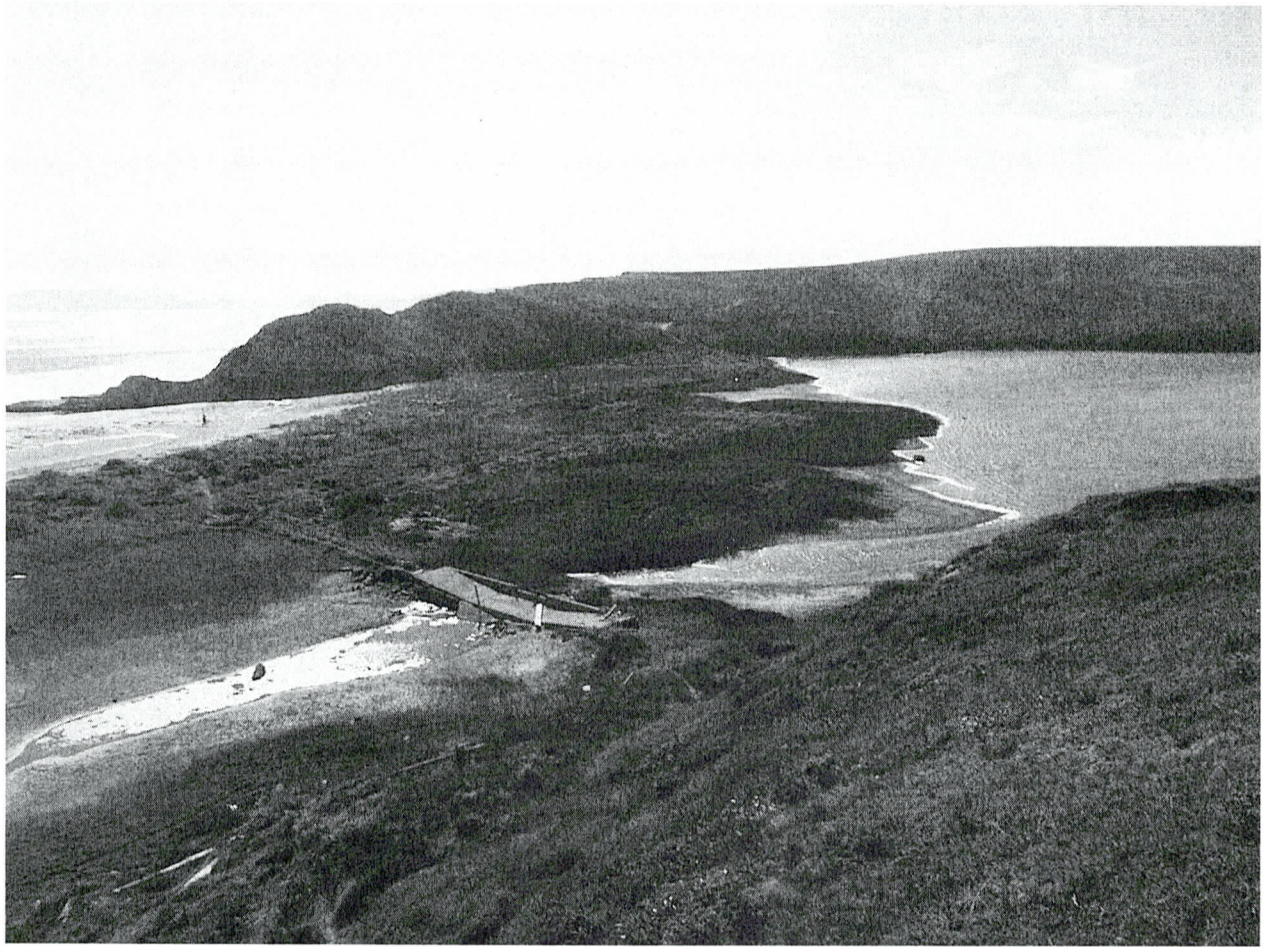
View of the concrete spillway in the southeast corner of Horseshoe Pond.
